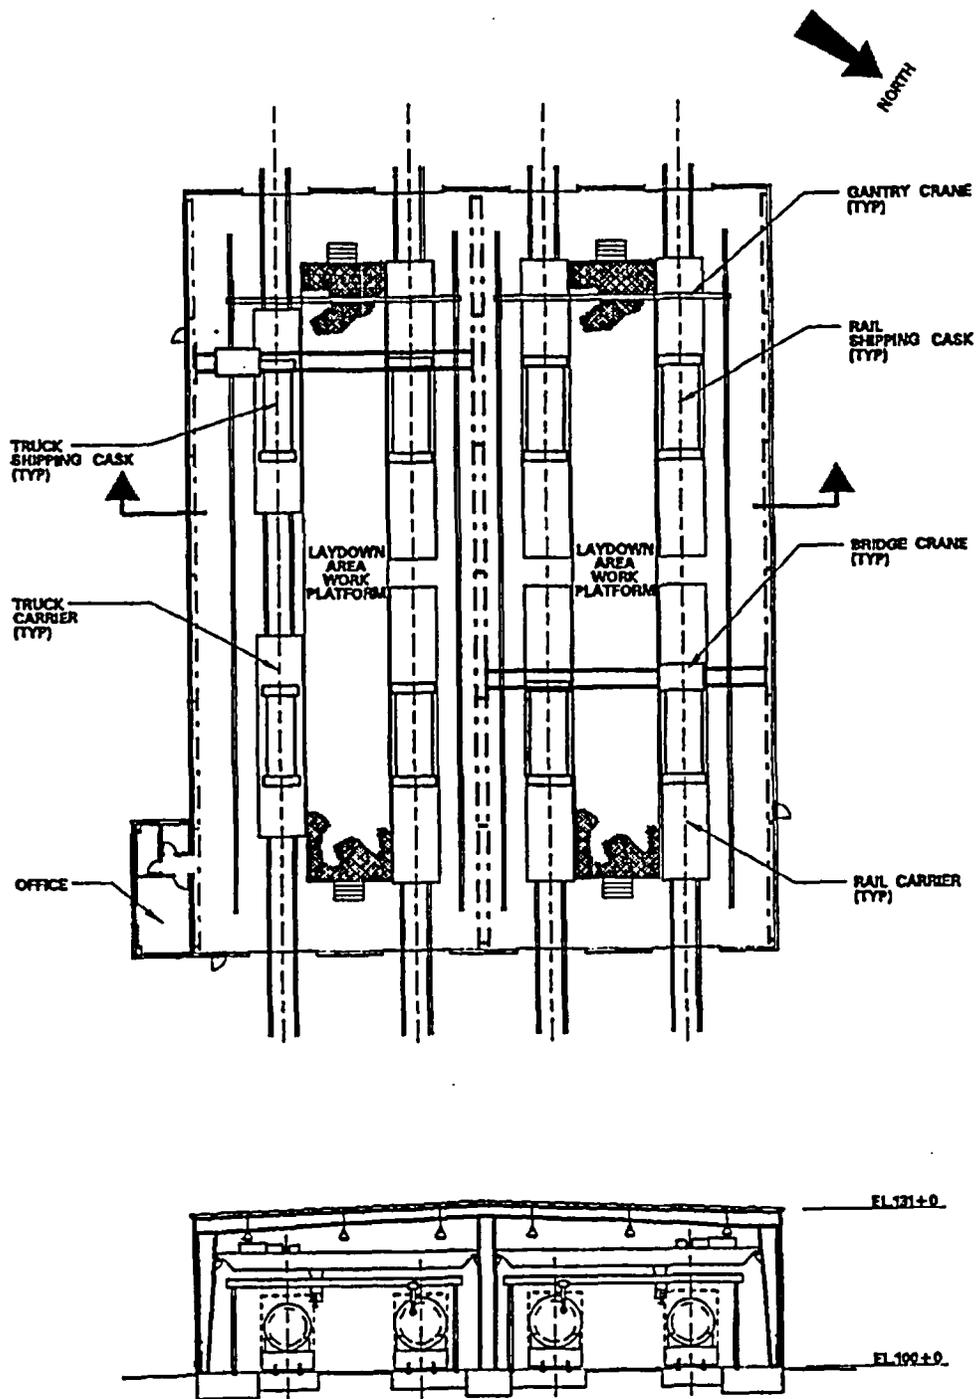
CSS (Floor Plan and Building Section)
